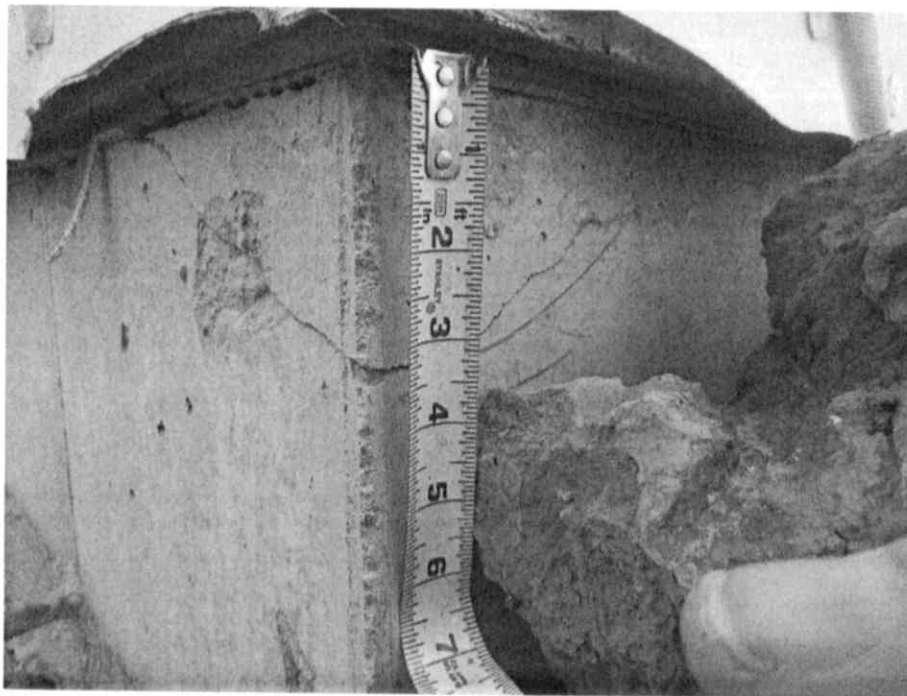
View of the northwest corner concrete crack at the top 4 inches of foundation wall height, extended upward along the north and west foundation walls approximately 8 to 10 inches in each direction before reaching the top of walls.
